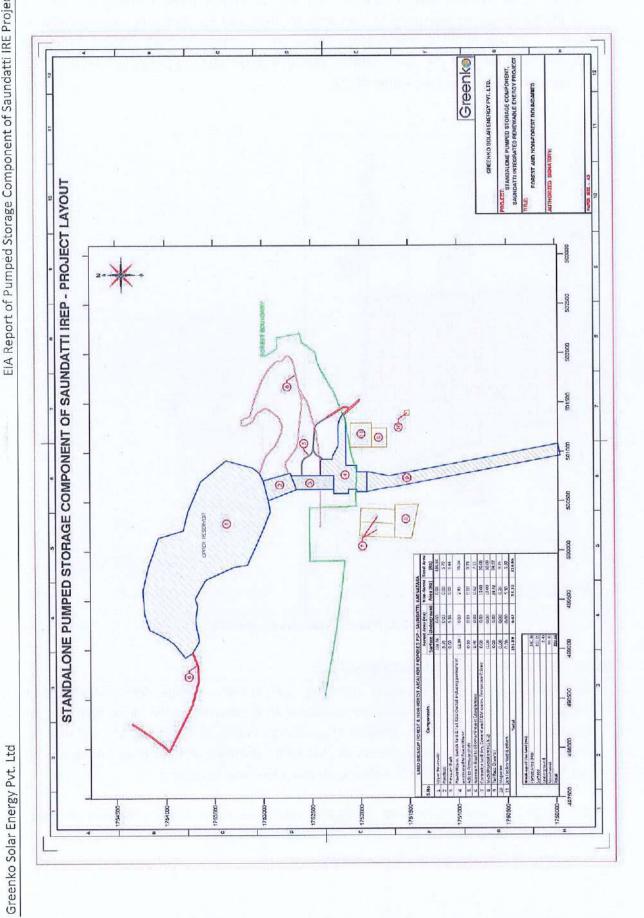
Layout Plan of Pumped Storage component of Saundatti IREP showing location of muck disposal sites
